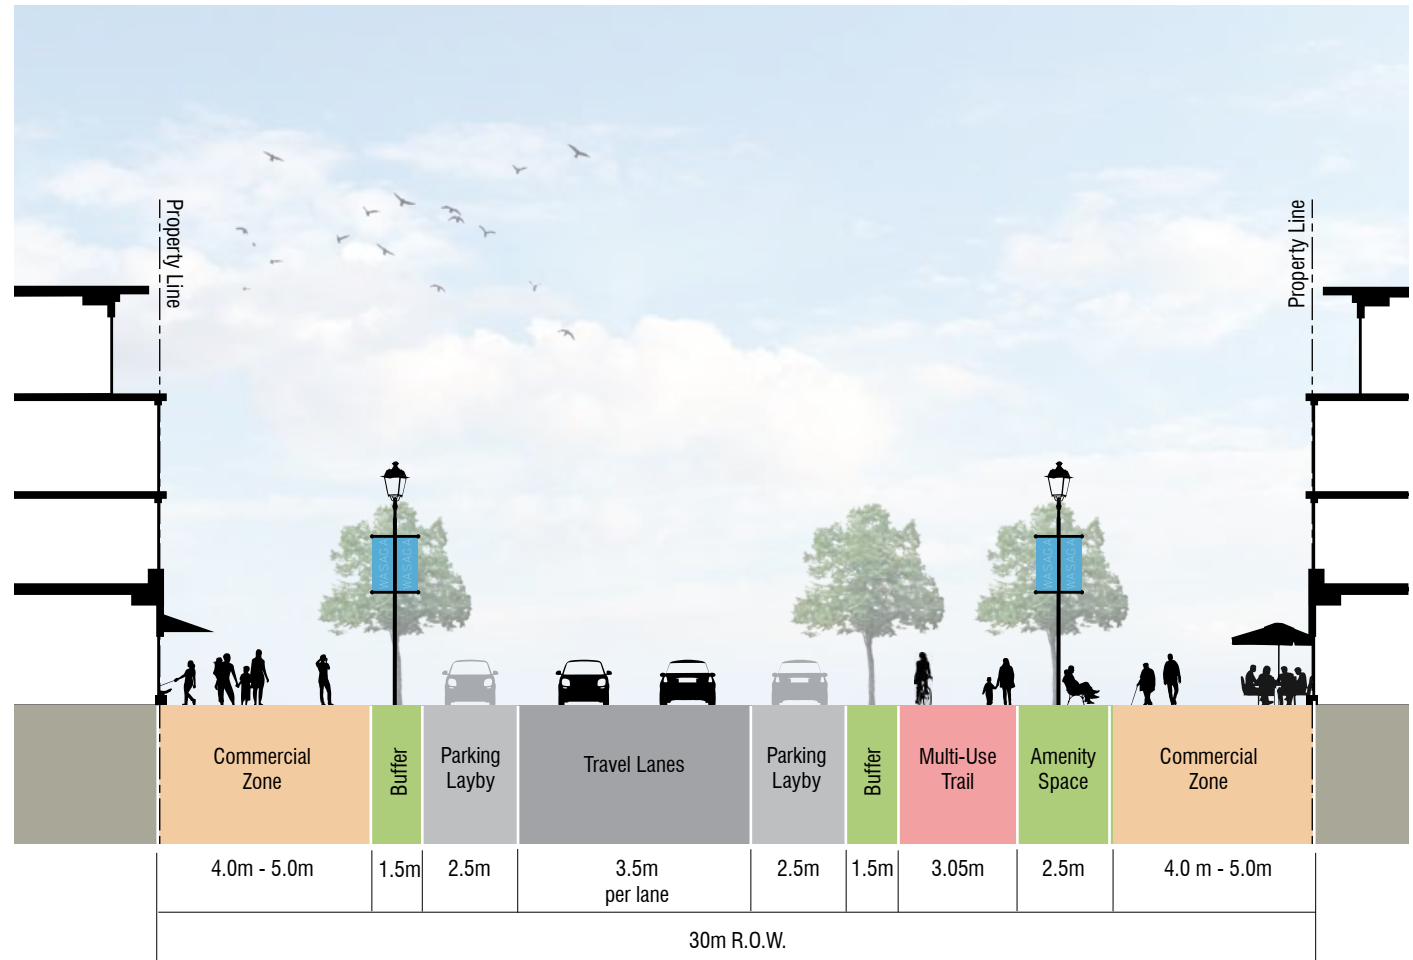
Main Street Downtown Core & Gateway Districts Street Section (30.0m R.O.W.)
